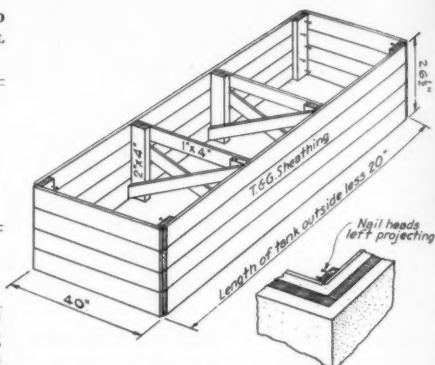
Perspective of inner form. Detail at right shows how corner of form is made.
